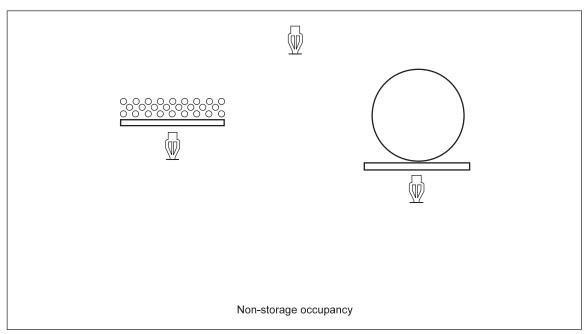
Additional sprinklers installed below non-flat, non-continuous, or non-solid obstructions between 4 ft (1.2 m) and 10 ft (3.0 m) wide with flat, continuous, solid barrier provided
